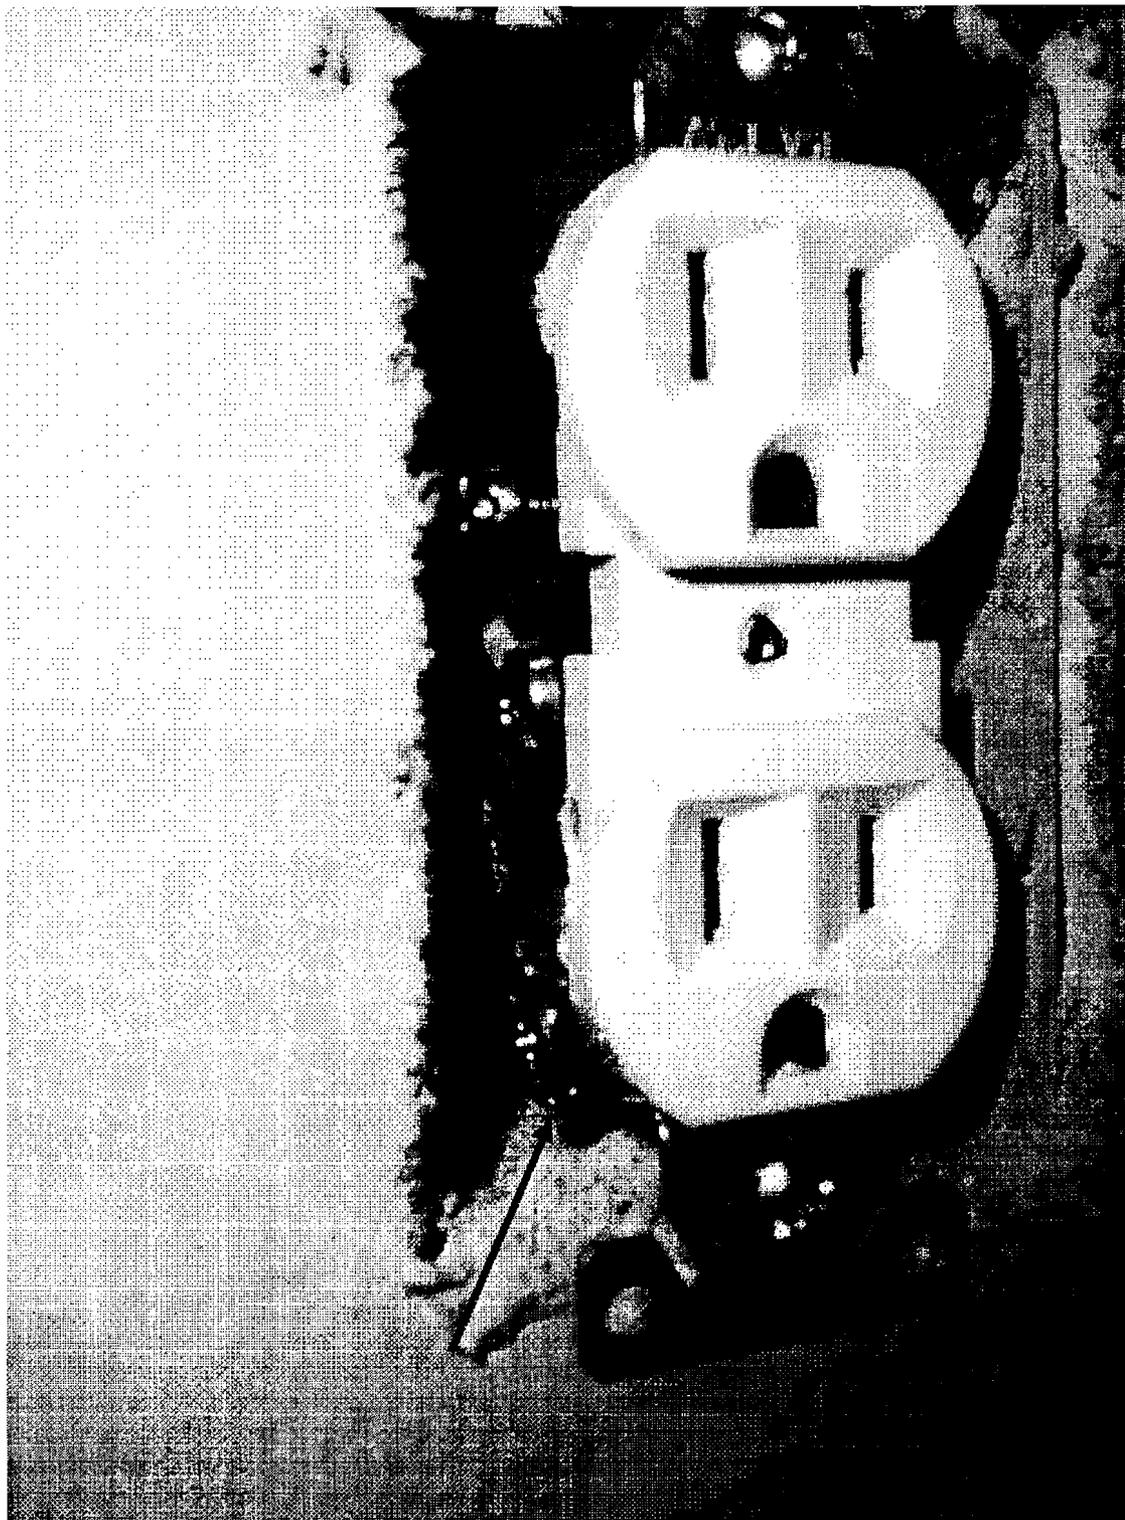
shows a view of a receptacle located in the upstairs hallway of the residence whose ground wire has blackened.
